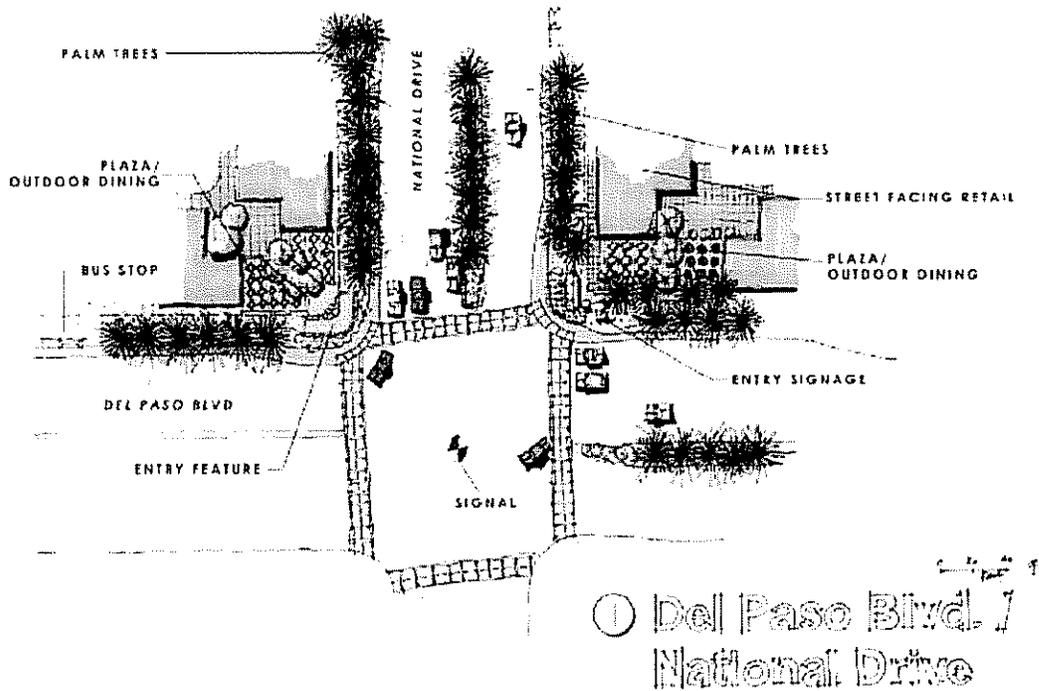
Schematic Landscape Plan 1: Del Paso Road and National Drive.
